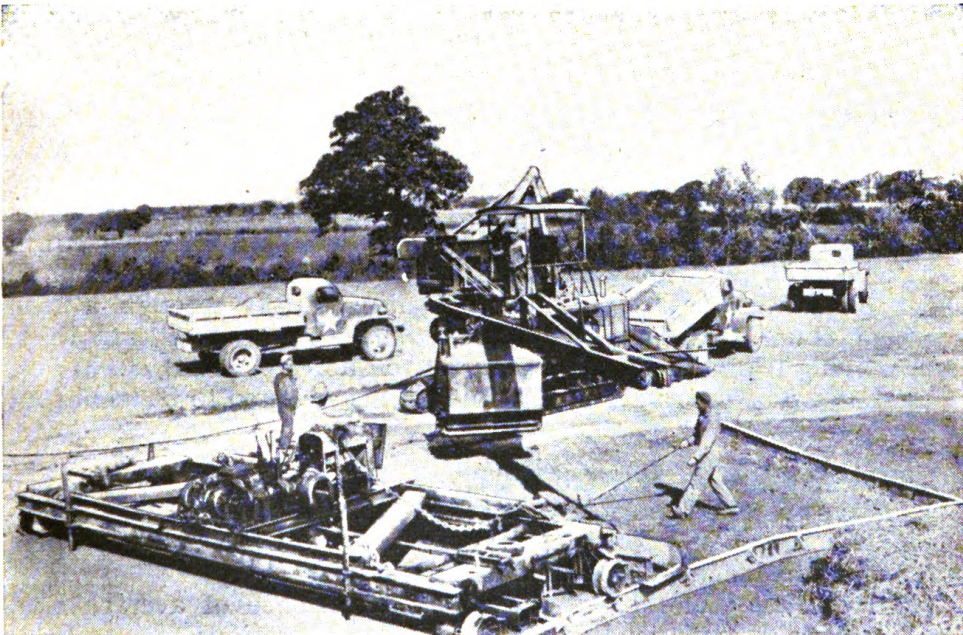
Concrete paving plant constructing taxiways for airfield. Plant consists of 34E paver, 20-foot-wide form-riding concrete finisher, dump trucks delivering batched aggregate, and steel forms.
